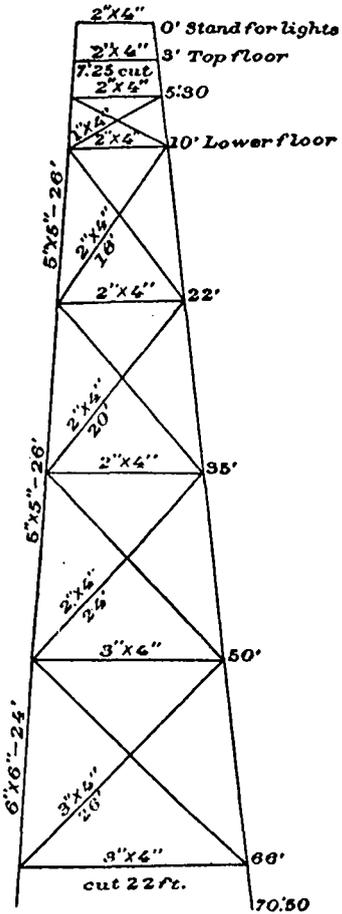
Working drawing of side of scaffold for 60-foot signal.
